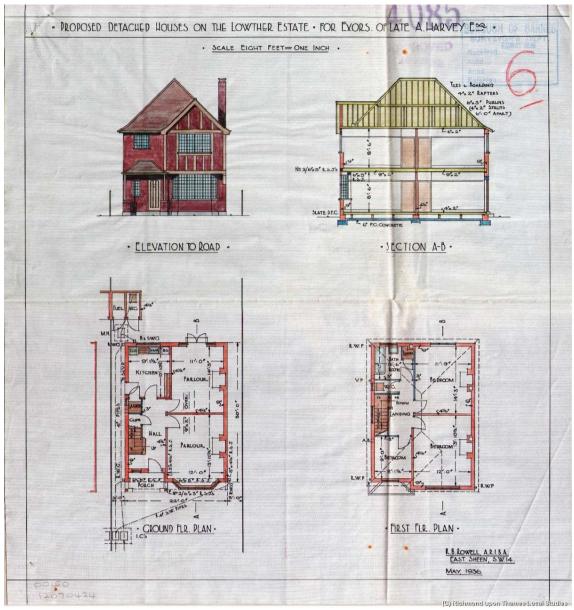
Application drawings for a detached house designed by R.B. Rowell in 1936 (Richmond Local Archive, PLA/00150).
